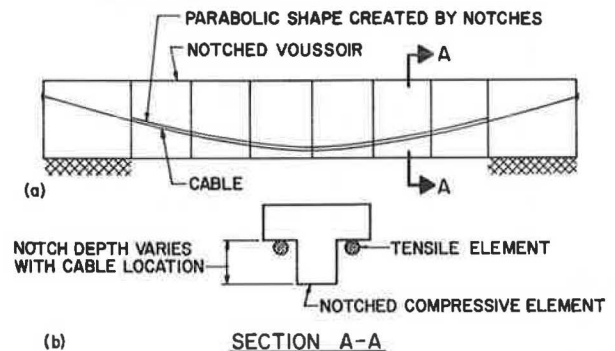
Typical Tension Arch structure in elevation (a) and section (b).
